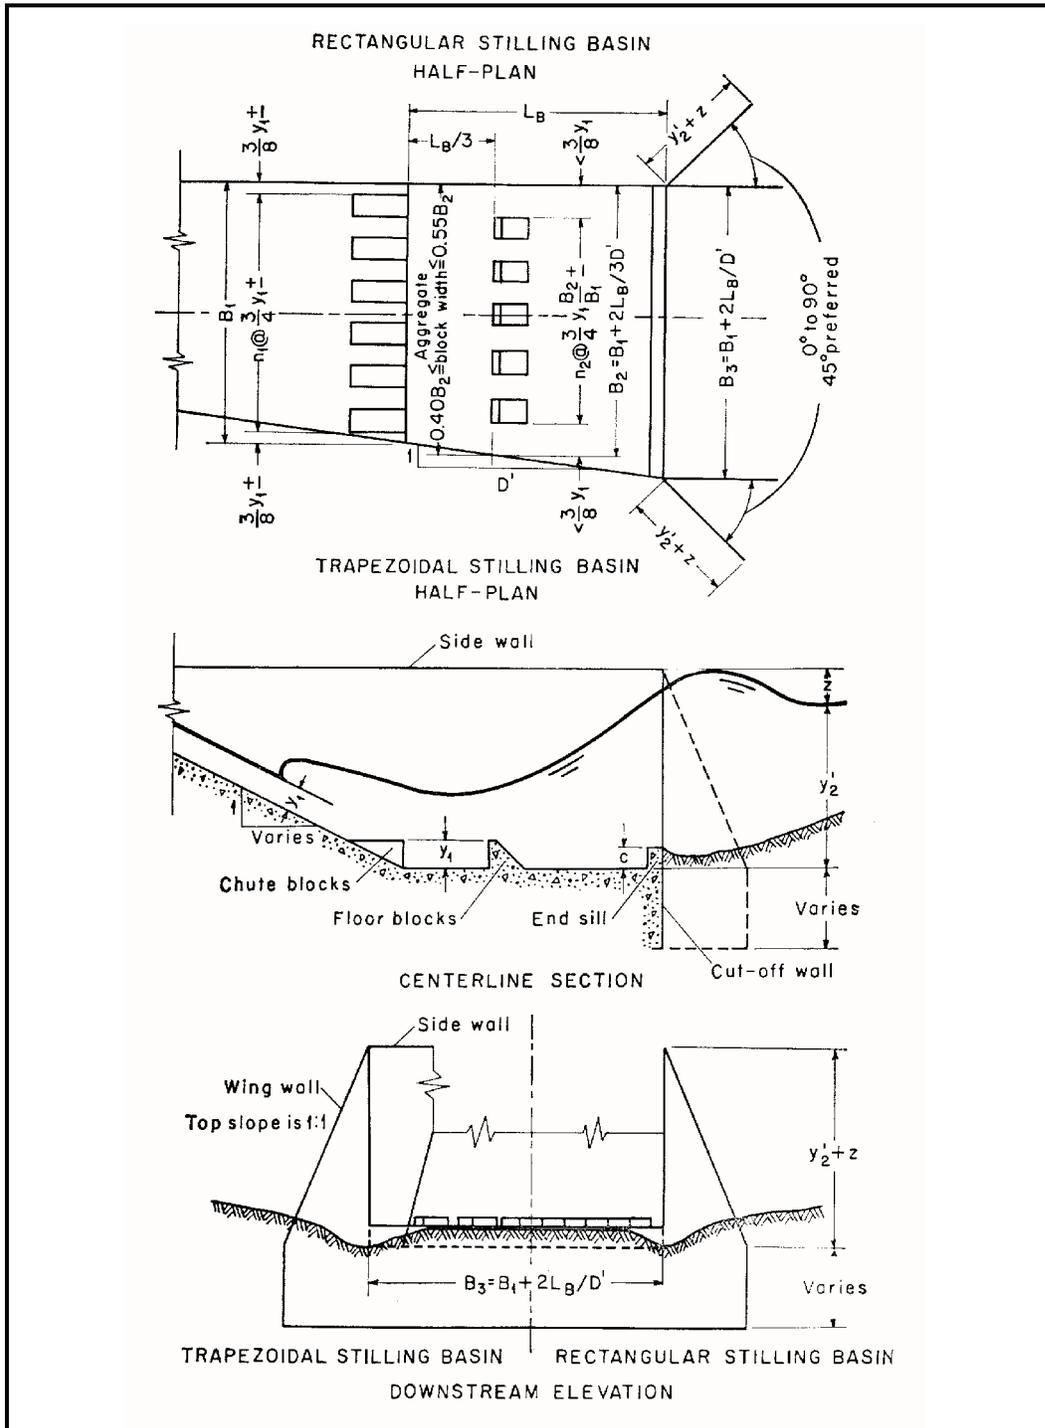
St. Anthony Falls (SAF) Type Drop Structure (Blaisdell, 1948)
